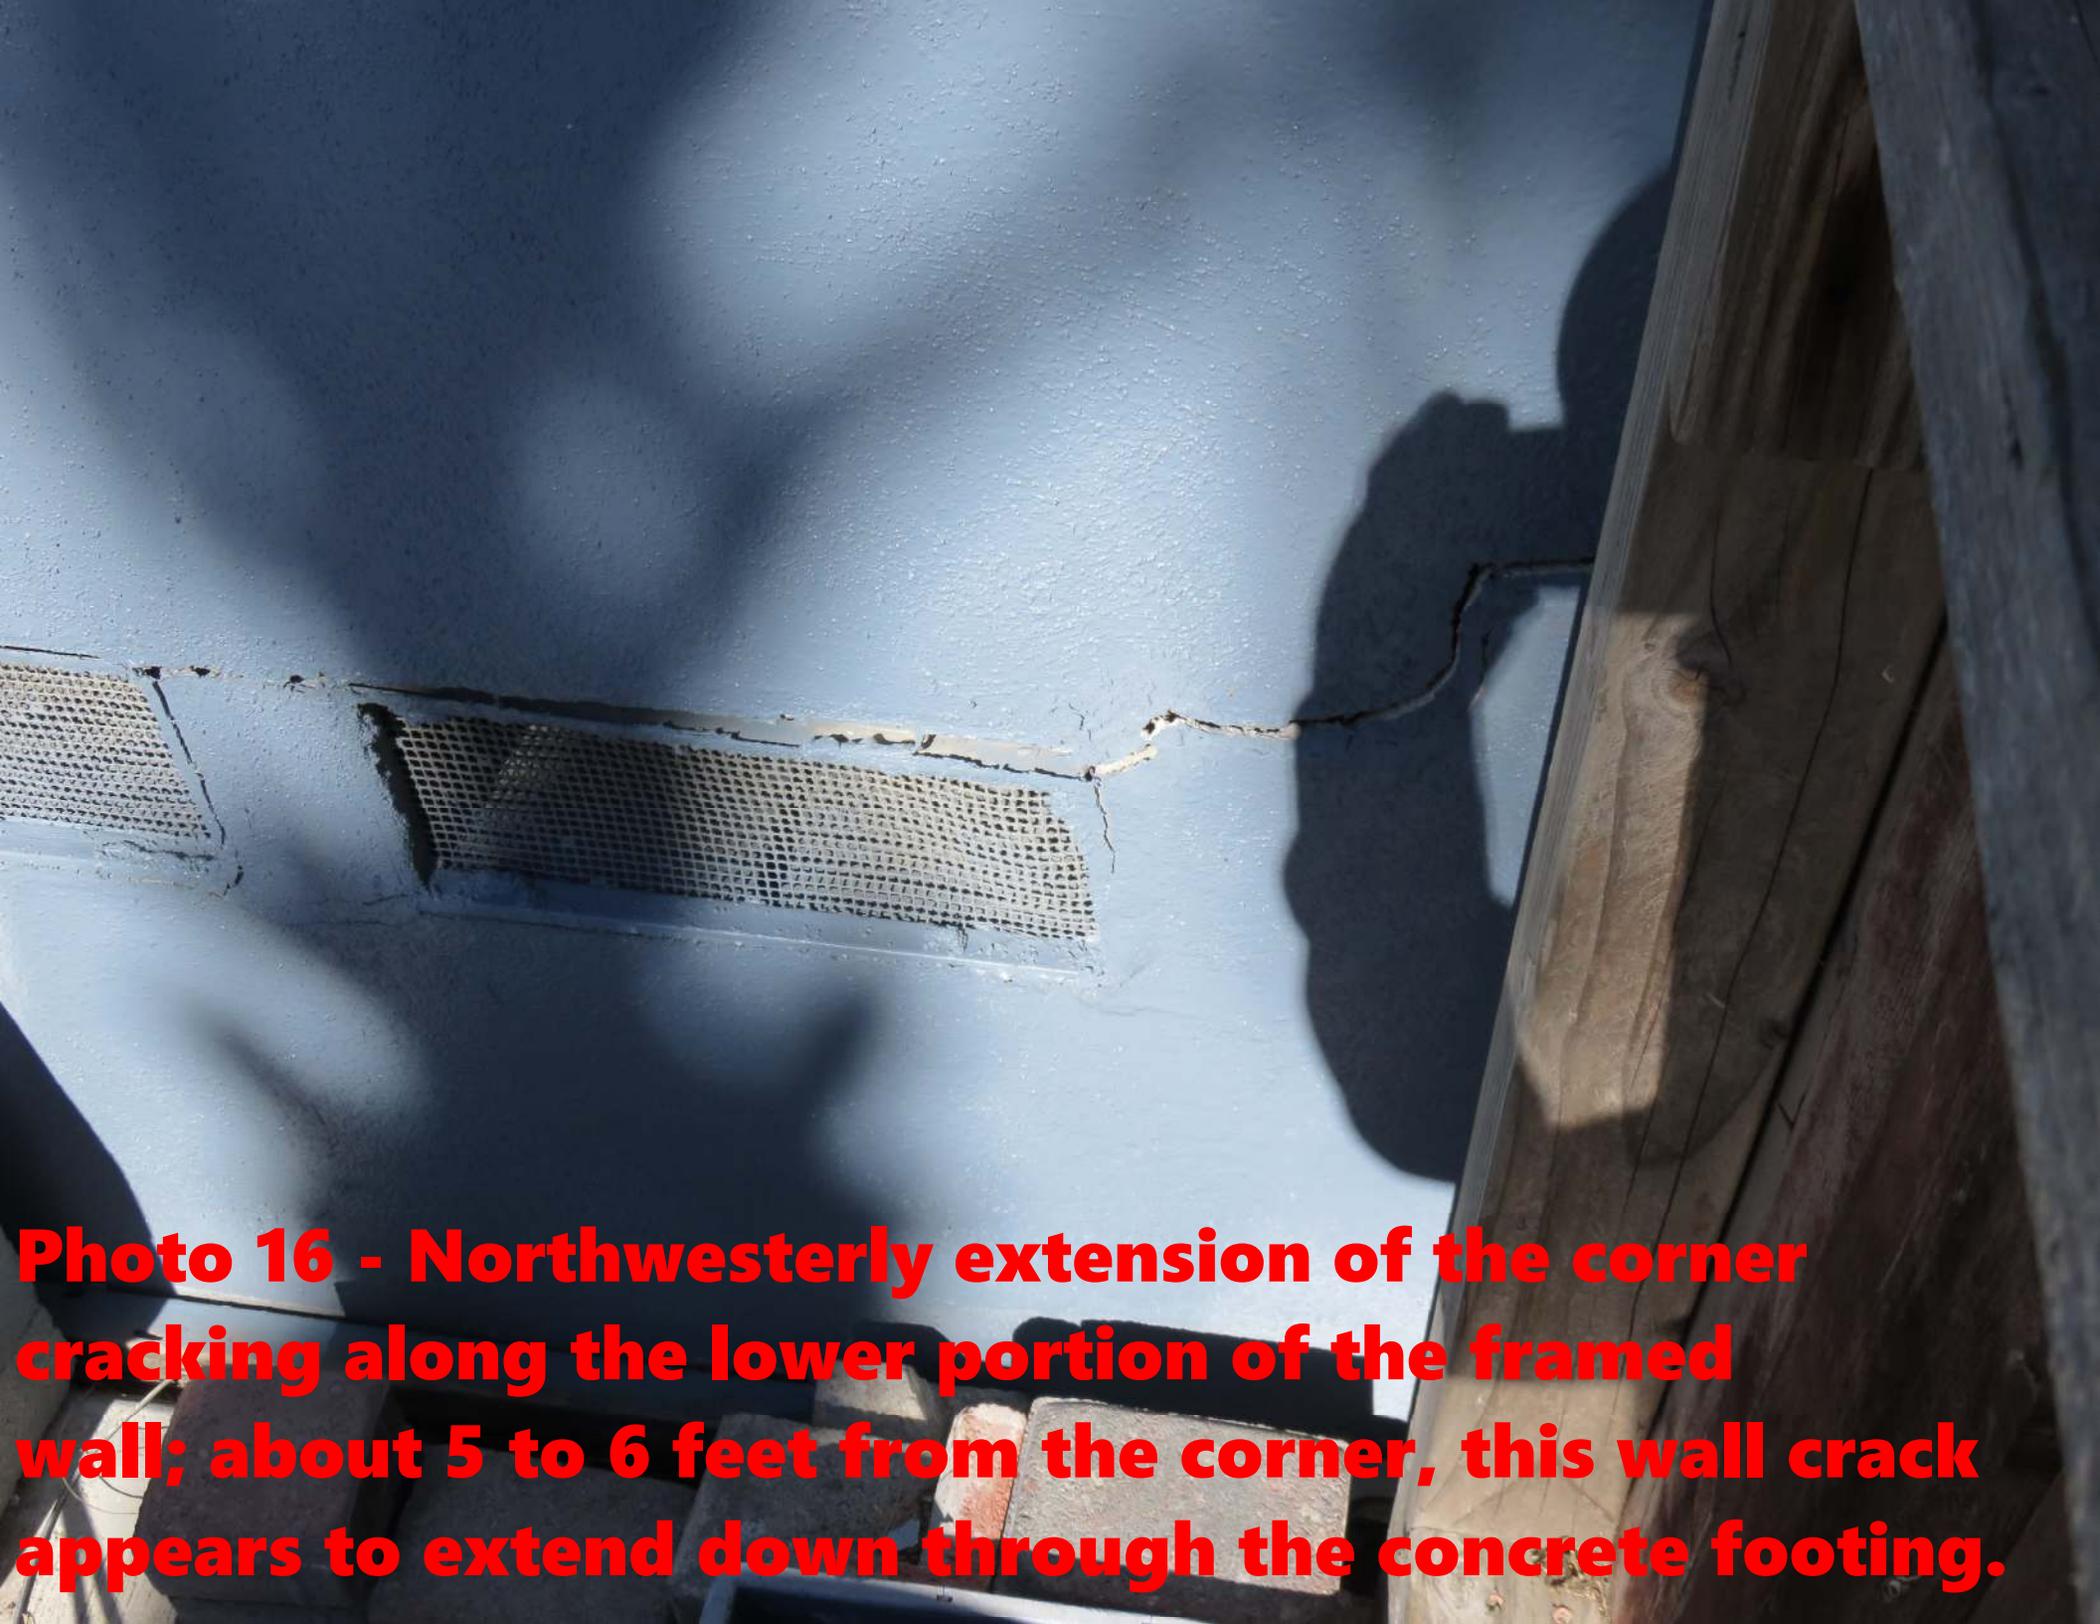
Northwestern extension of the corner cracking along the lower portion of the framed wall; about 5 to 6 feet from the corner, this wall crack appears to extend down through the concrete footing.
